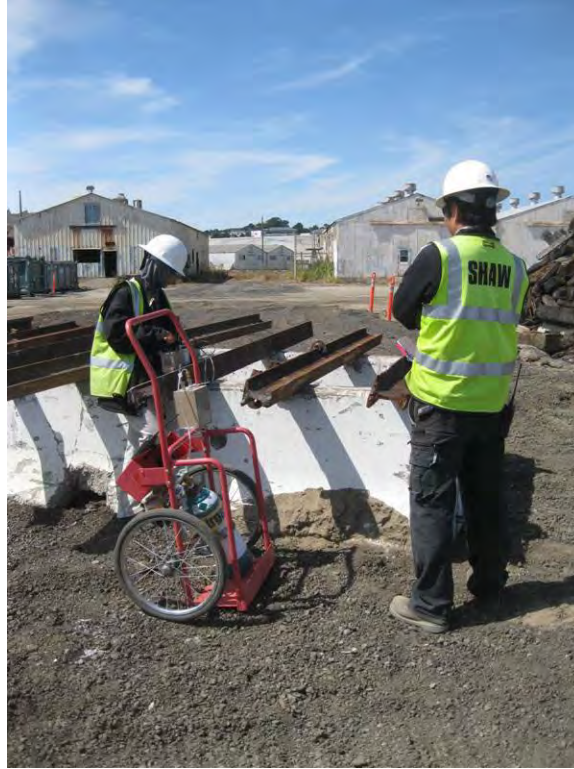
Gamma walk survey in WA 28—September 6, 2012
